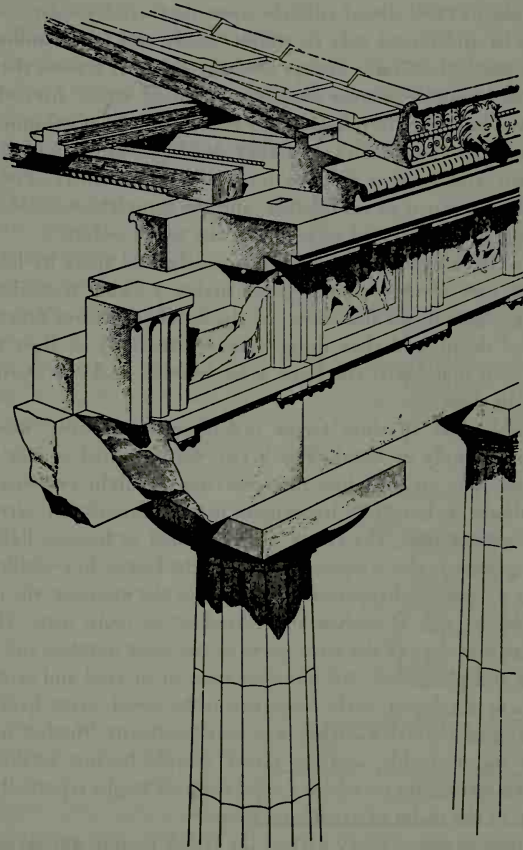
Schematic drawing to illustrate the construction of a typical Greek entablature in the Doric Order.
